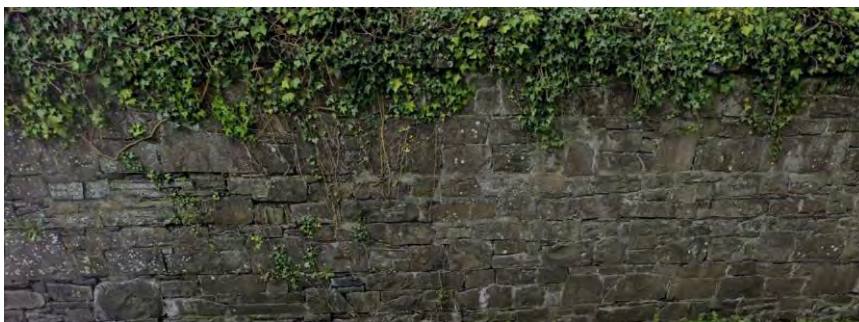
Image of existing coursed masonry wall along Mill Lane
